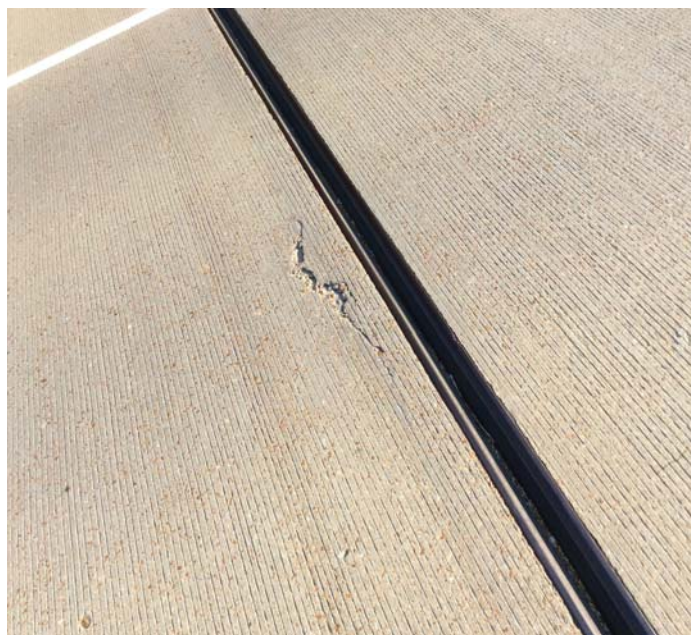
Description Span 3 deck left lane at bent 4 two foot long crack / delam.
